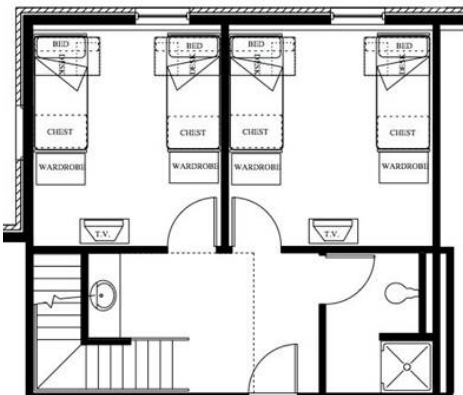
Loft unit, lower level floor plan, Maple Hill housing
